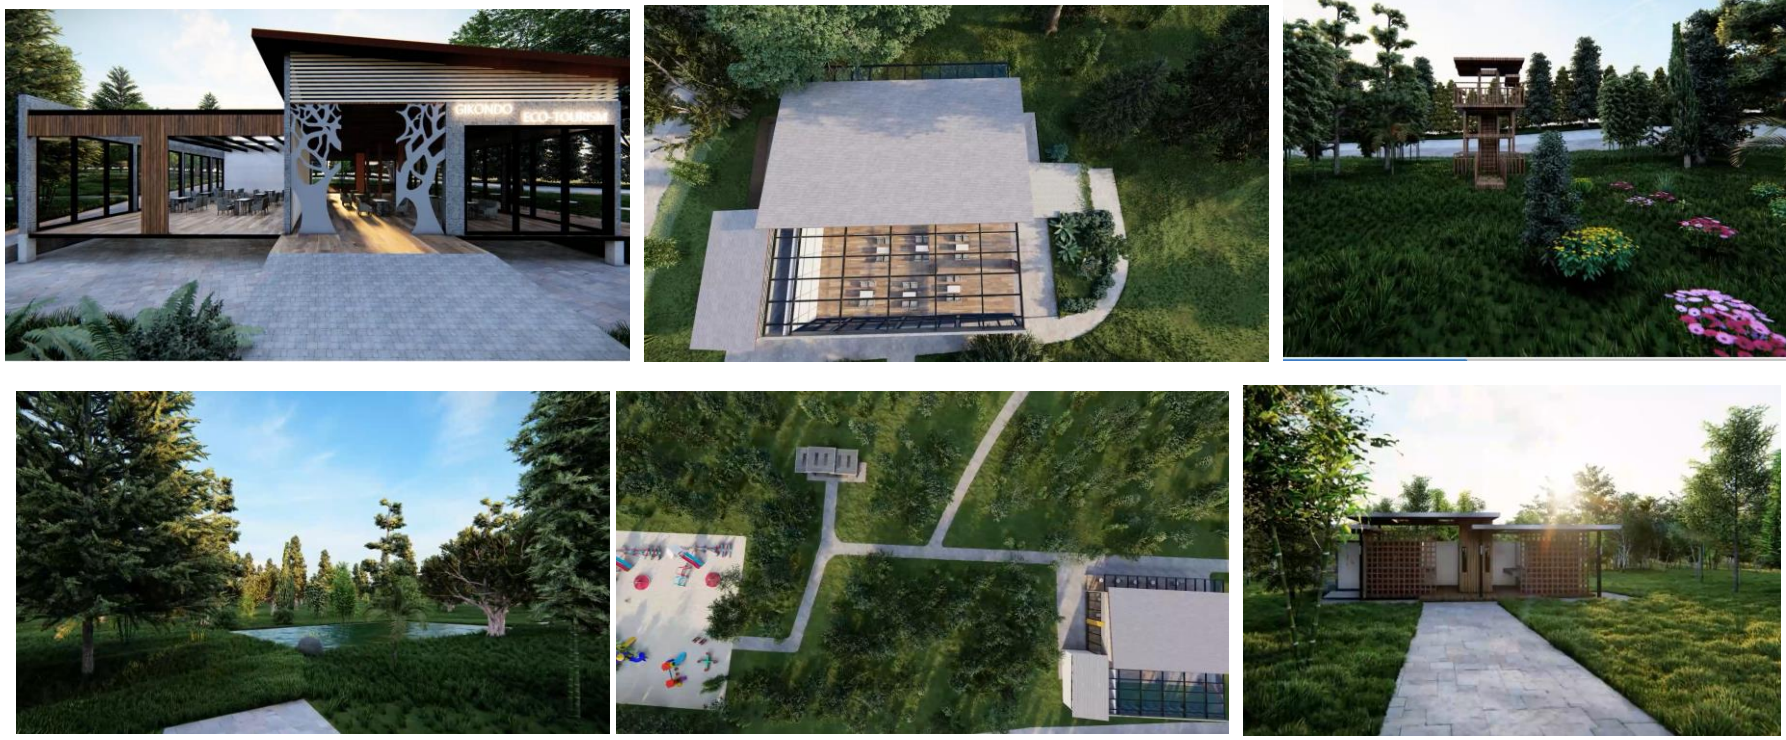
DETAILS OF GIKONDO WETLAND MASTER PLAN
